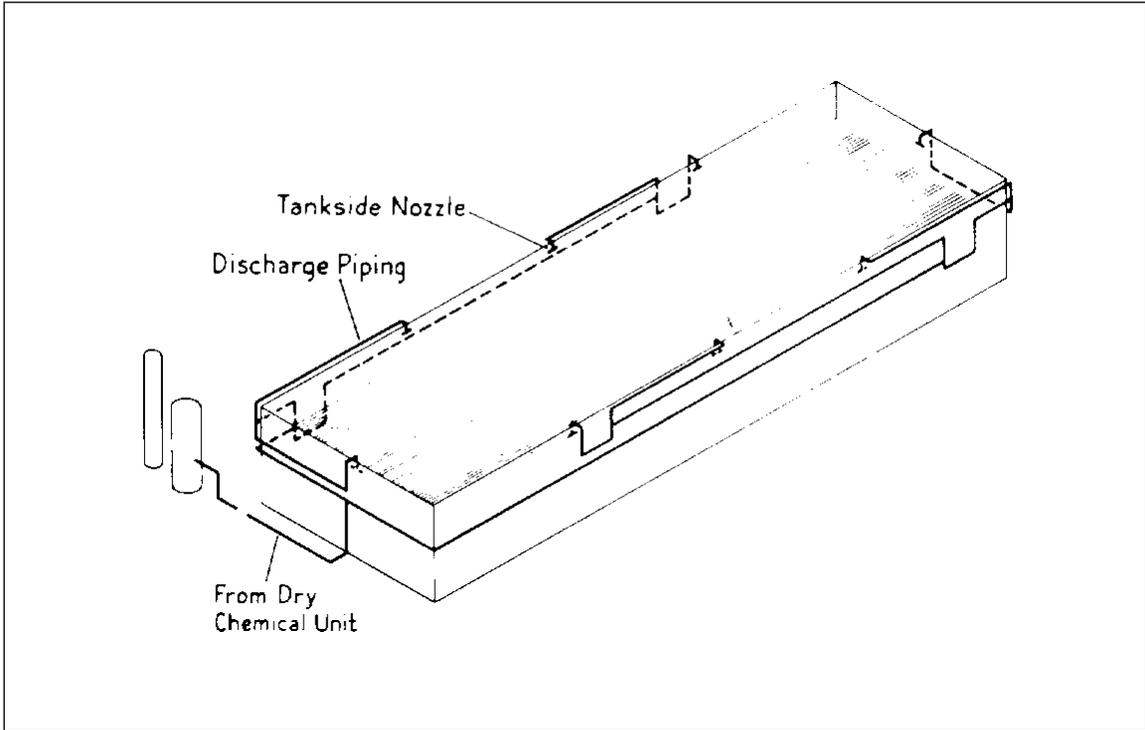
Local-application system. Typical arrangement of piping and nozzles at dip tank.
